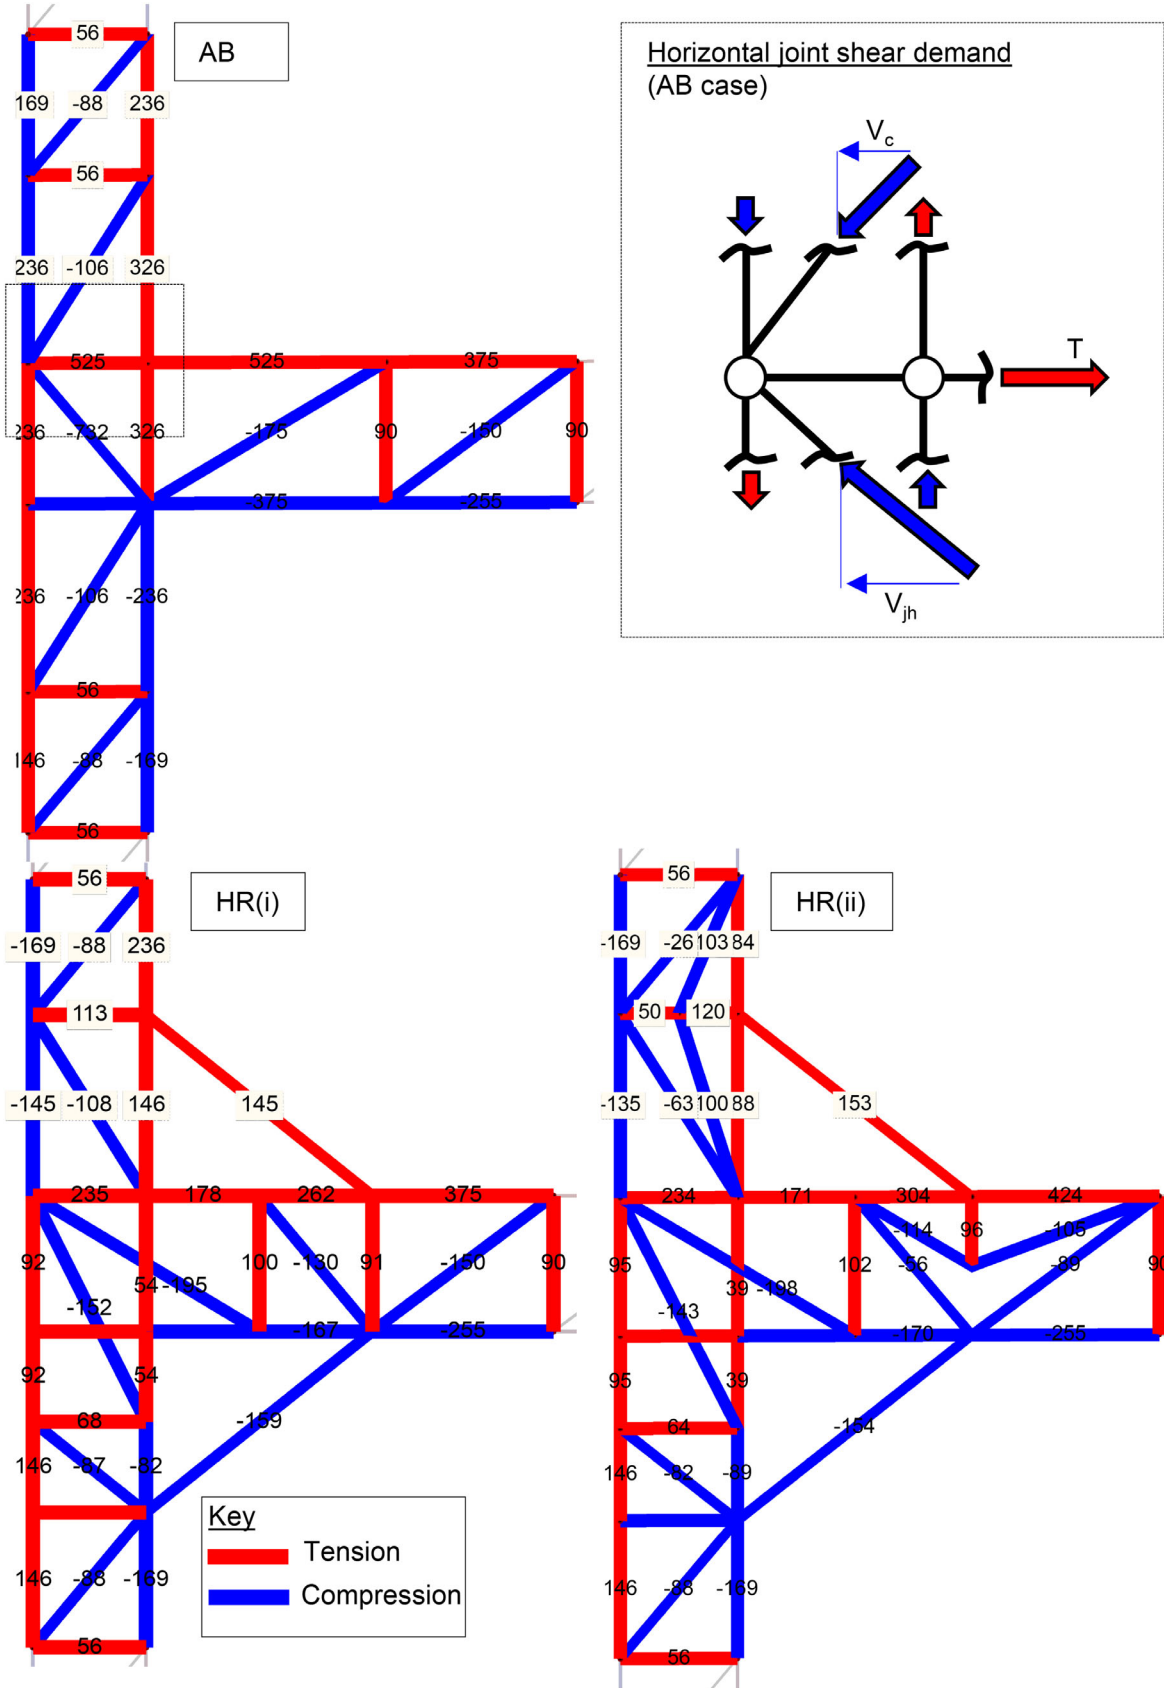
Axial forces of STM equivalent trusses applied to specimens JT1 (AB) and JT1-4 (HR), tested by Genesio<sup>29</sup>. (Notes. Forces are in kilonewton. The Reader is referred to the color version of this figure.) STM, Strut-and-Tie method.
